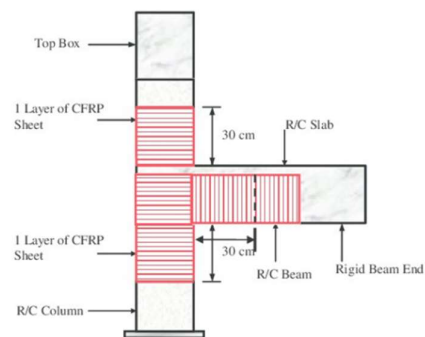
FRP strengthened RCC beam-column joint with shear wall schematic diagram
